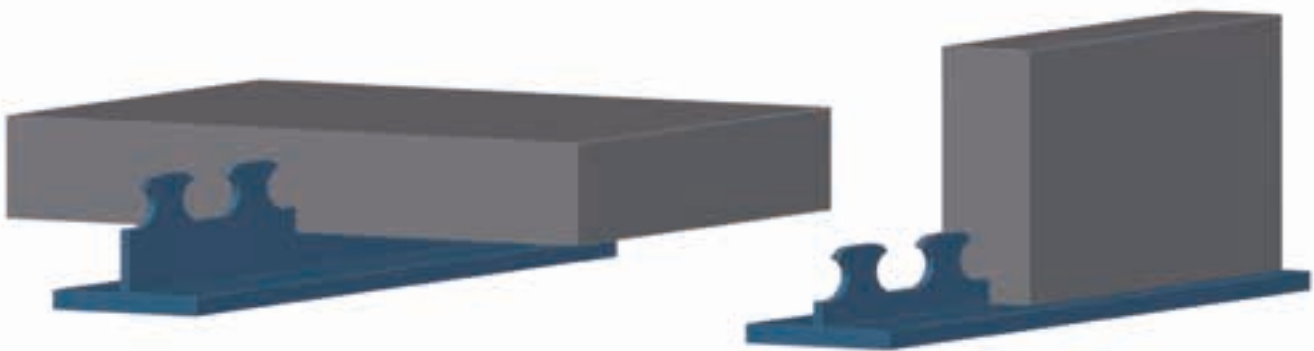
Vertical use of stud rails in slabs (left) and horizontal use in wall elements (right)
